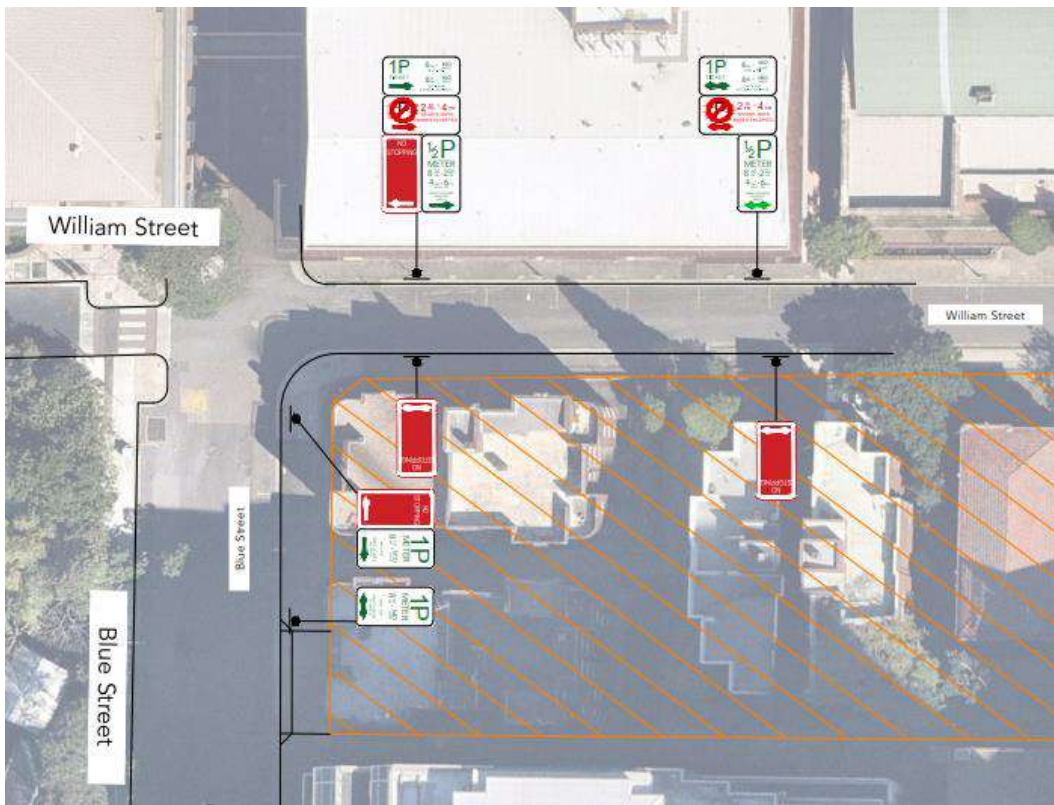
Existing Signage Plan in William Street and Blue Street Intersection
